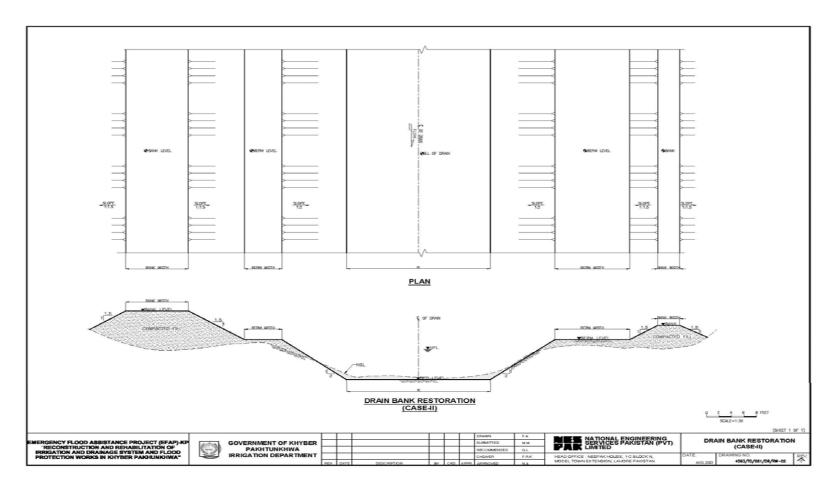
Typical Cross Section for Drain Bank Restoration
